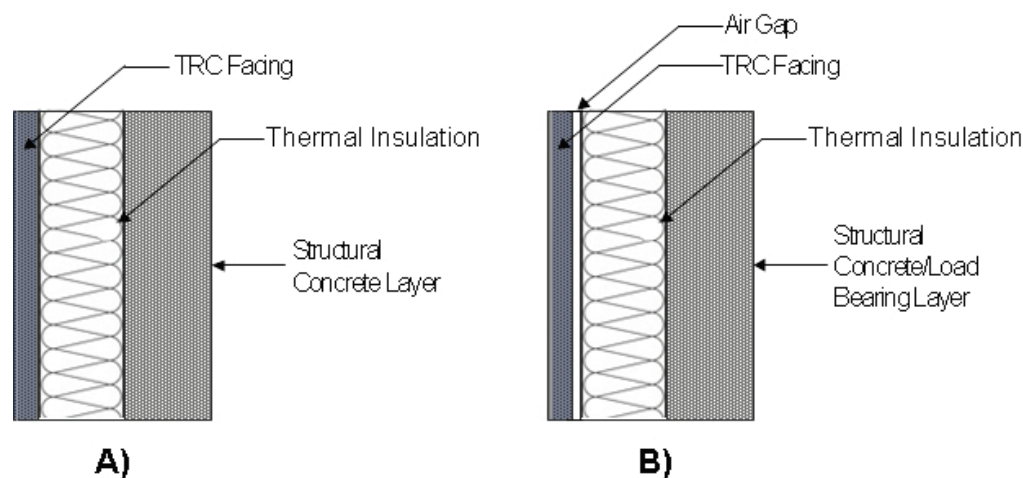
Sandwich elements and cladding panels out of TRC: a) Sandwich elements with facing shell of textile concrete, b) Ventilated façade system: textile-reinforced cladding panel with air gap (Redrawn based on (Brameshuber, 2006)).
